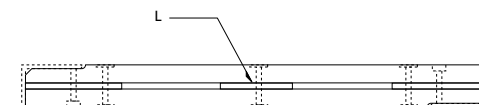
DETAIL E WOOD RAIL ASSEMBLY PLAN VIEW
